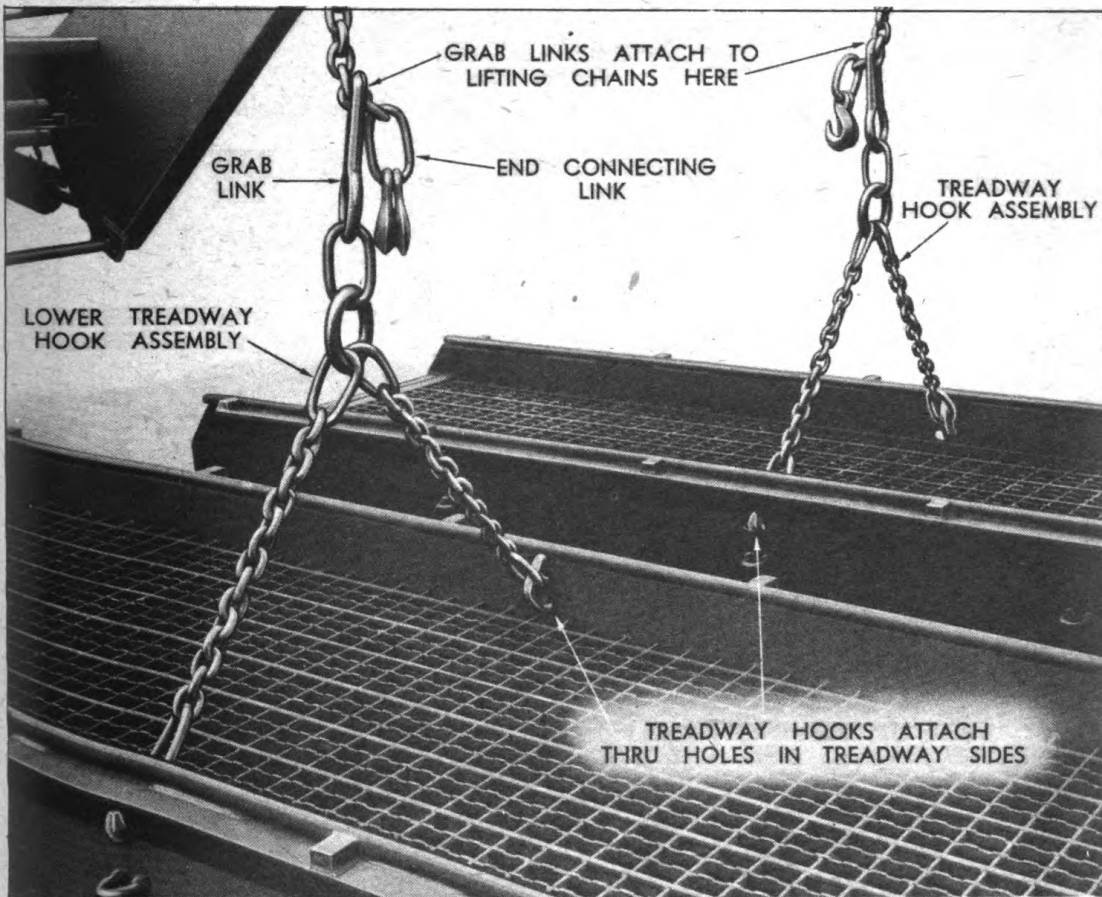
Proper Method of Attaching Lower Treadway Hooks
